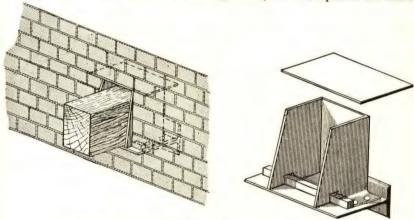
Method of Supporting Wood Beam in a Brick Wall
